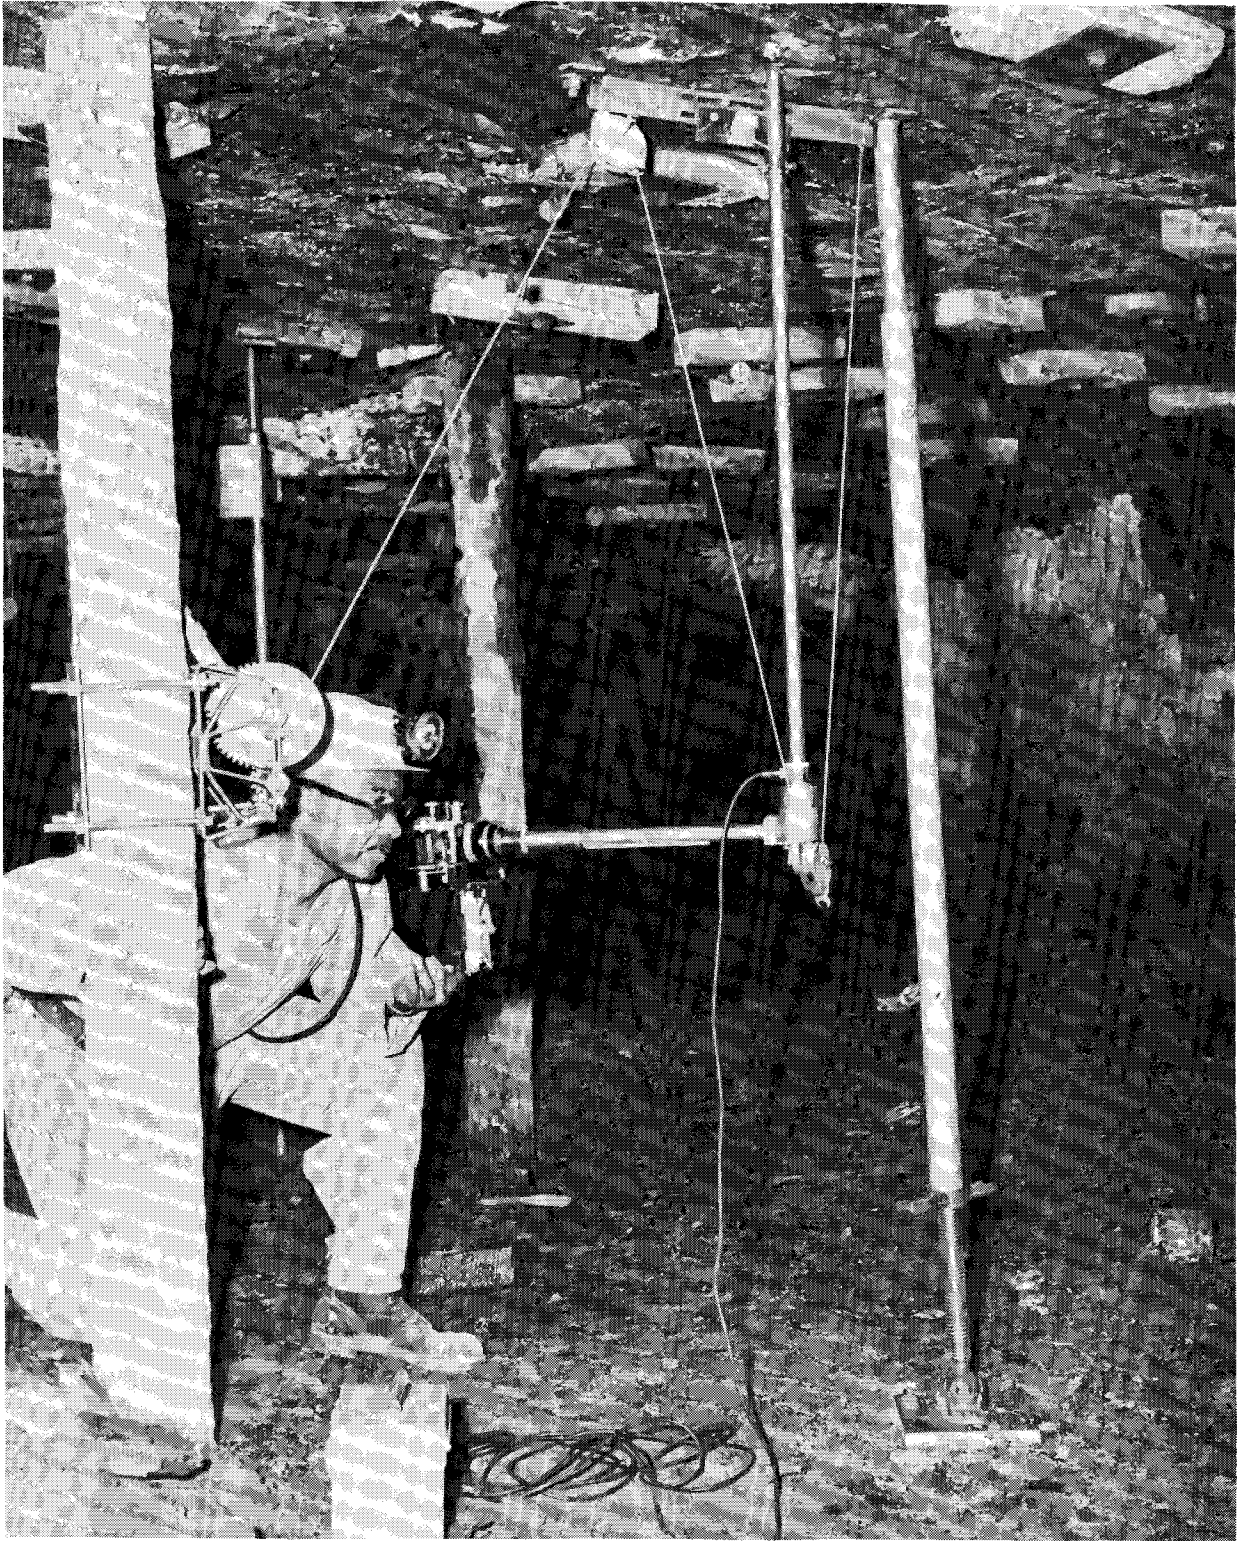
Camera-Borescope Assembly To Record Fractures in Mine Roof Penetrated by 40-Foot Borehole Near Longwall Face.
